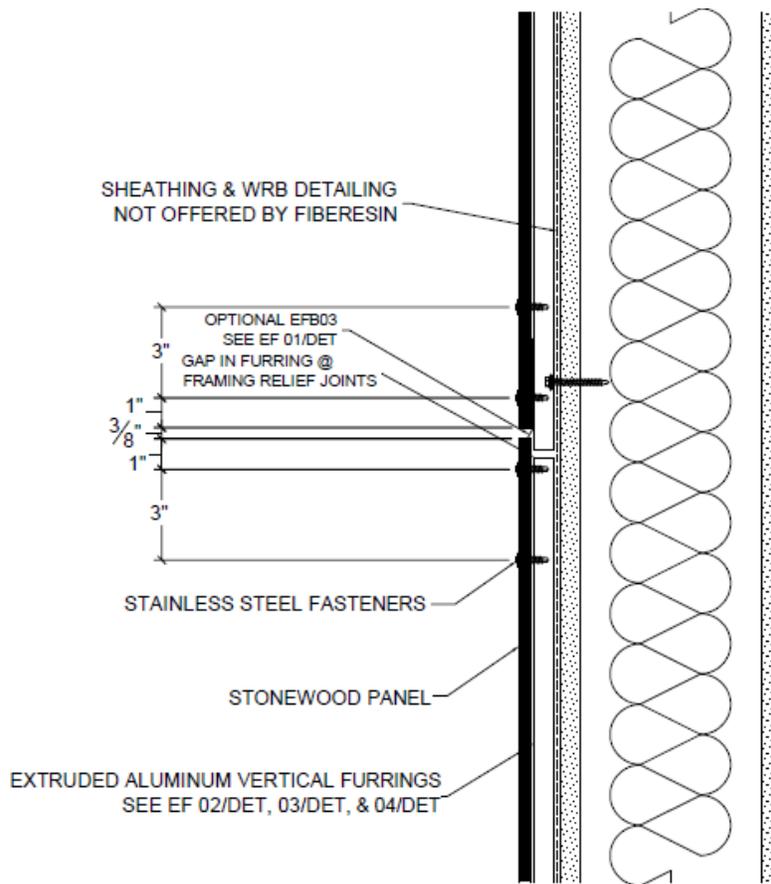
STONEWOOD EXTERIOR ARCHITECTURAL PANELS EXPOSED FASTENER SYSTEM DETAILS HORIZONTAL PANEL JOINT
